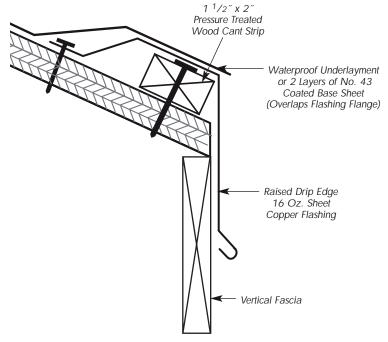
1 1/2" x 2" Cant Strip Installed Directly to the Wood Deck
